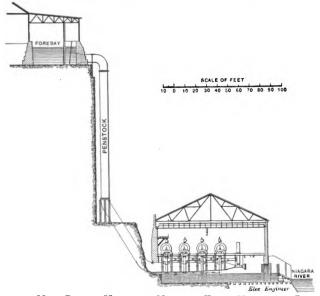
New Power House of Niagara Falls Hydraulic Power and Manufacturing Co. Sectional View.
